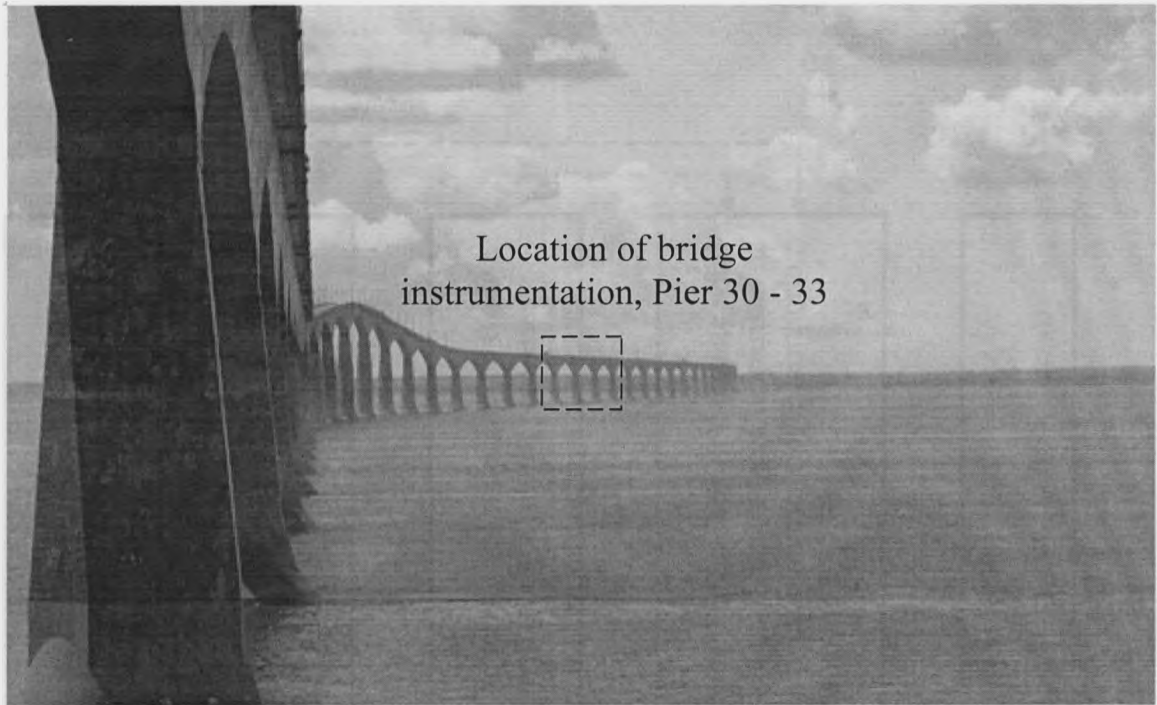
Confederation Bridge Looking towards New Brunswick [courtesy Strait Crossing Bridge Limited]
